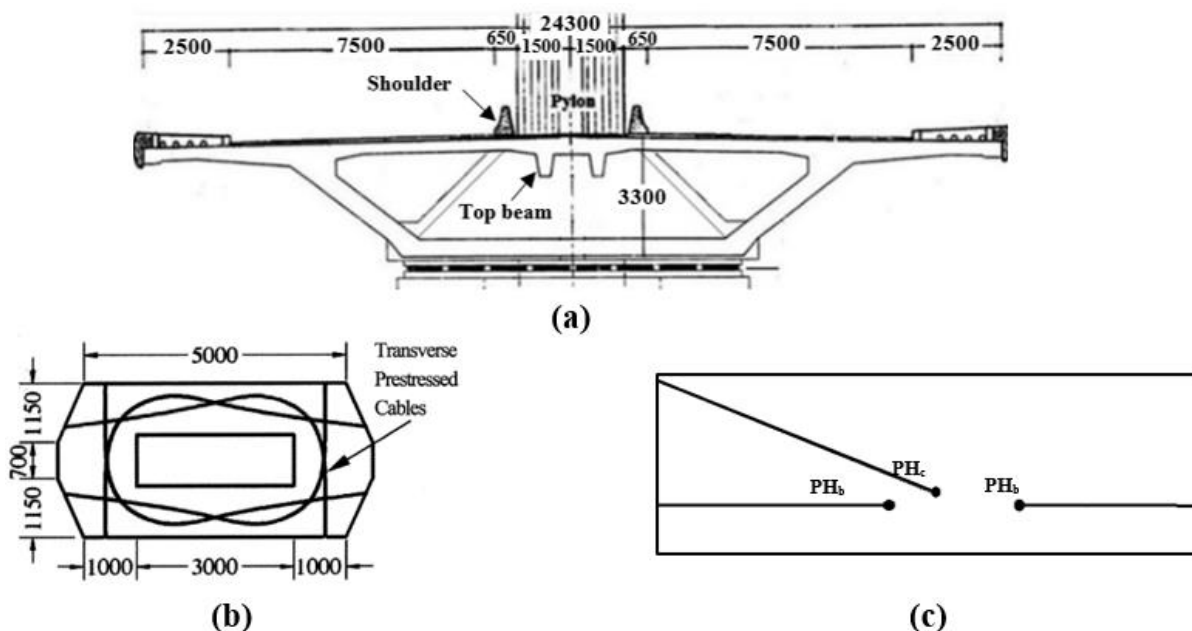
The section of bridge main elements; (a) Pylon section (Unit: mm), (b) Deck section (Unit: mm), and (c) Location of plastic hinges.
